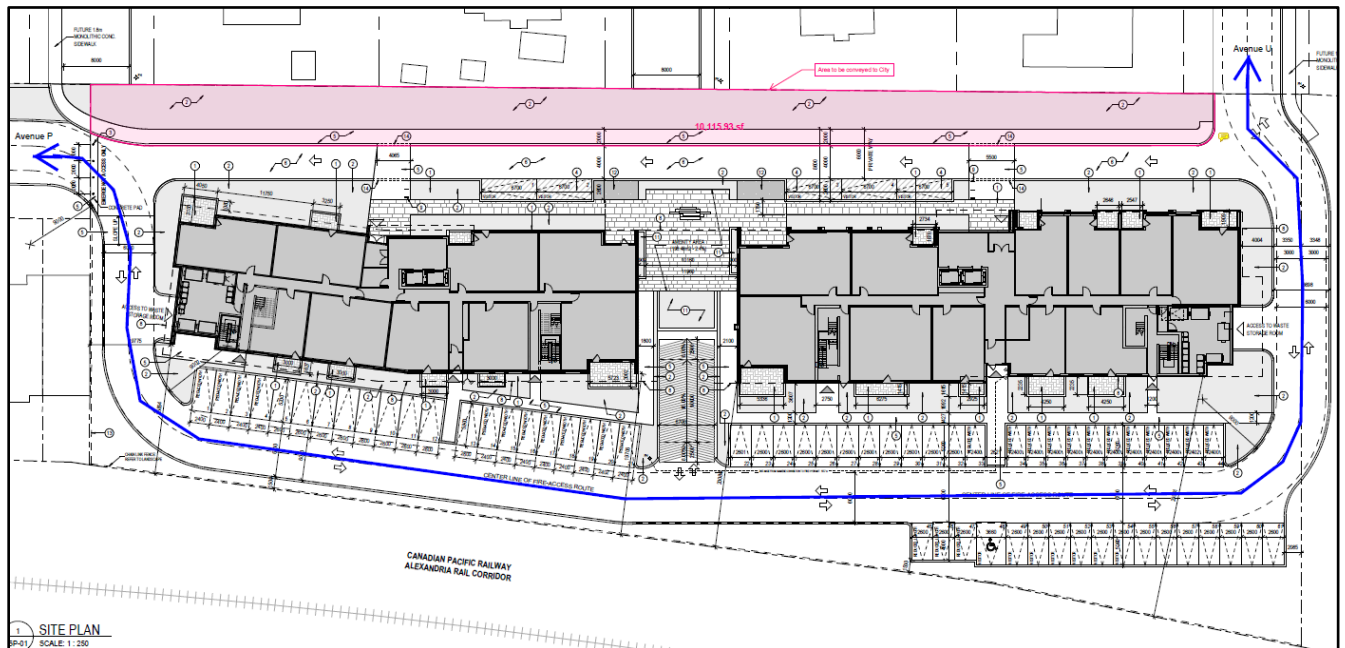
1399 Avenue U (Phase 1) Site Plan, Indicating Lands to be Conveyed and Fire Route
